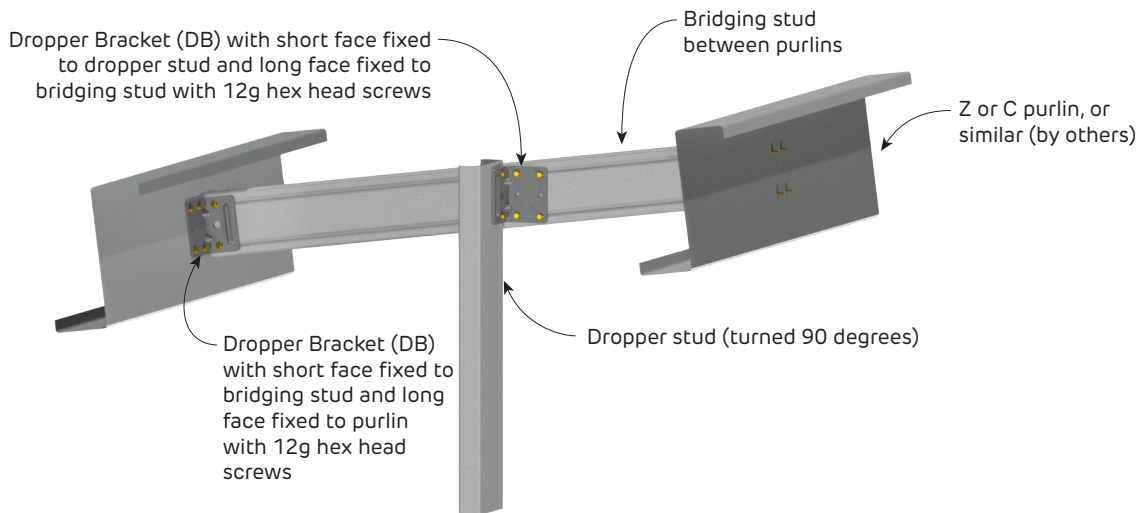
Alternative Dropper Stud to Bridging between Purlins
